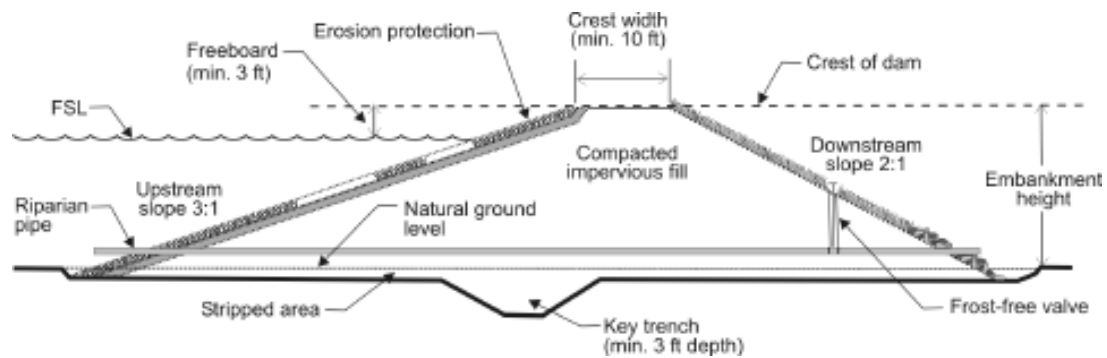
Cross-section of an earthfill dam (Source: WEDC, UK)
